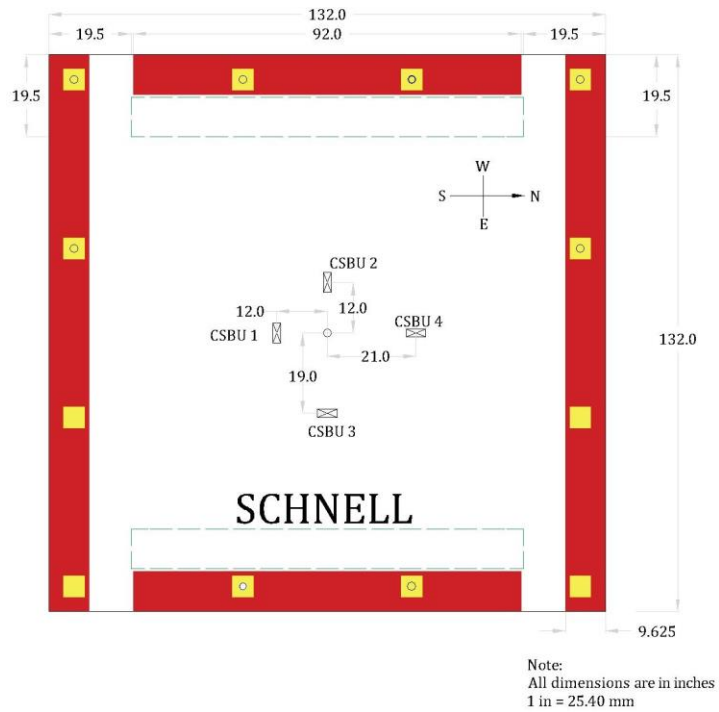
Concrete Strain Gauge Location for Slab Specimen B
